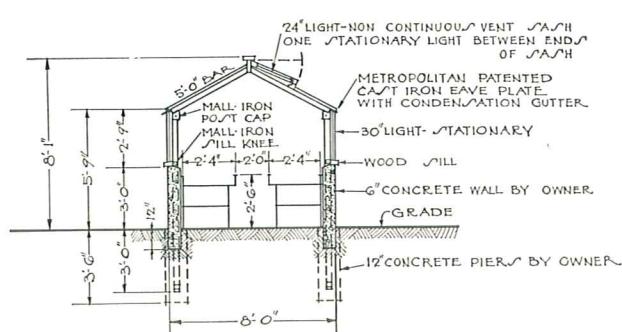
Standard frame construction for Metropolitan Semi-iron-frame Greenhouses of the high-eave type with side walls made up of ventilating and stationary sash on concrete wall, showing section and details at posts.
